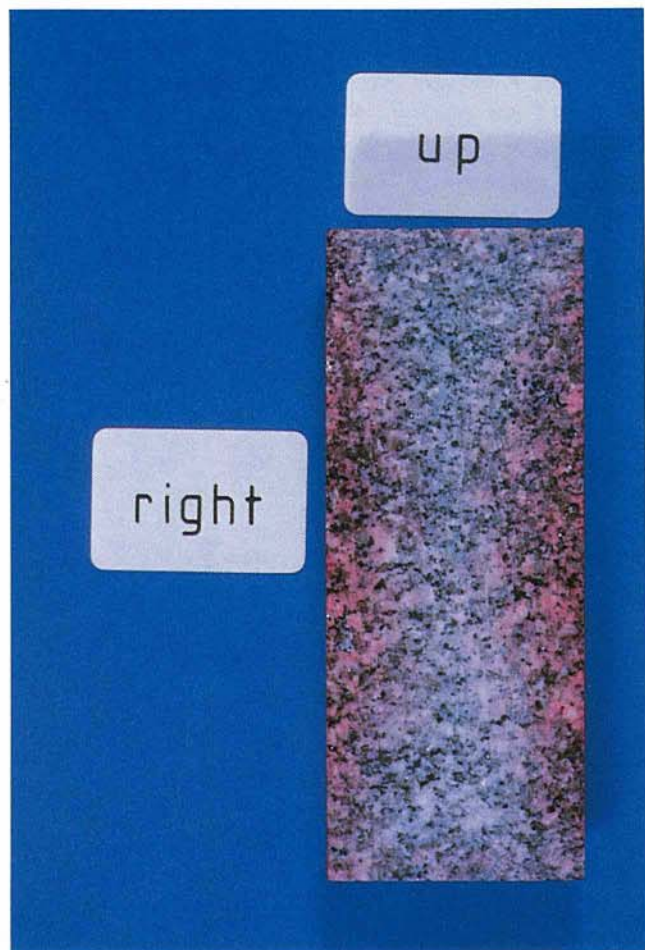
The cross-sectional view of the dye-penetrated specimen.
